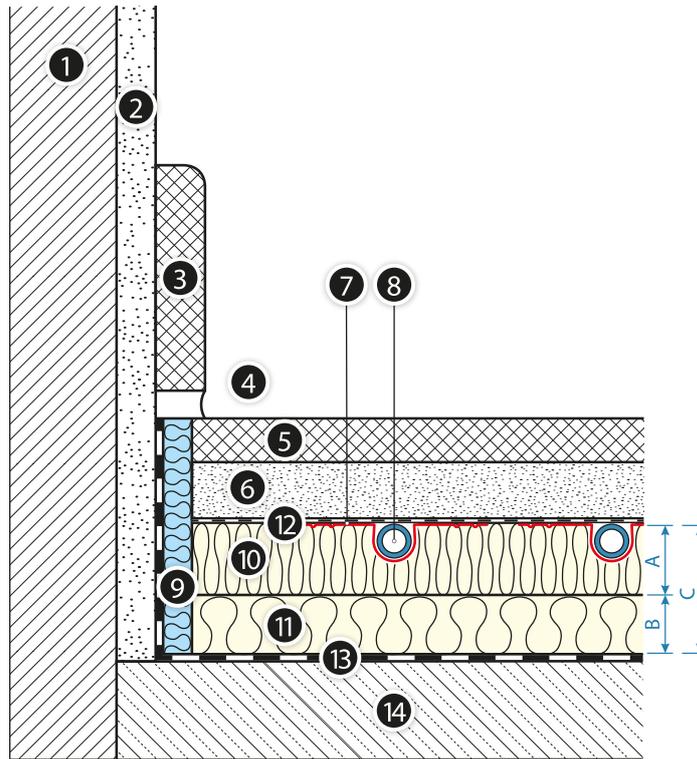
Floor heater with KAN-therm TBS System board and supplementary insulation and damp-proof coating on the ceiling laid out on the ground
